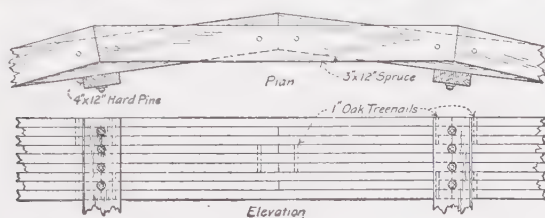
a*.—Wooden Curbing for Pier Foundation.
